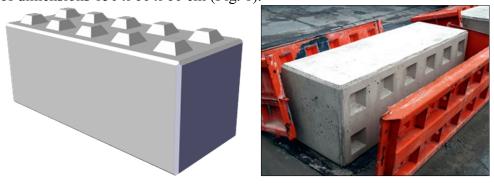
The basic unit of the retaining walls of precast betonblok elements
